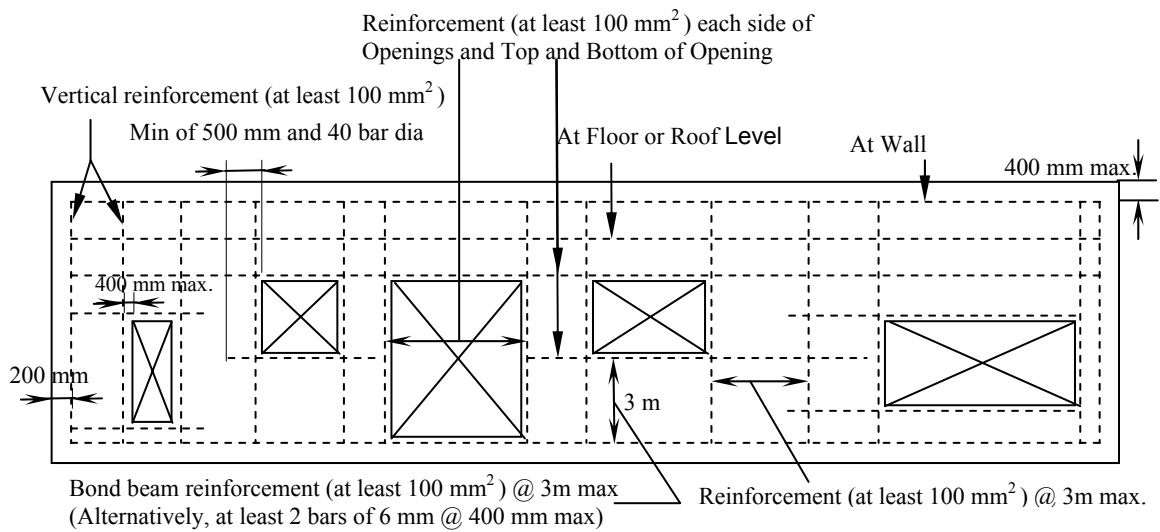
Provision of minimum reinforcement as per clause 7.2.1.1, 7.2.1.2 and 7.2.1.3
